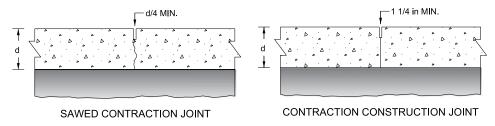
Contraction joints for parking lots serving light vehicles (primarily automobiles and pickup trucks)
